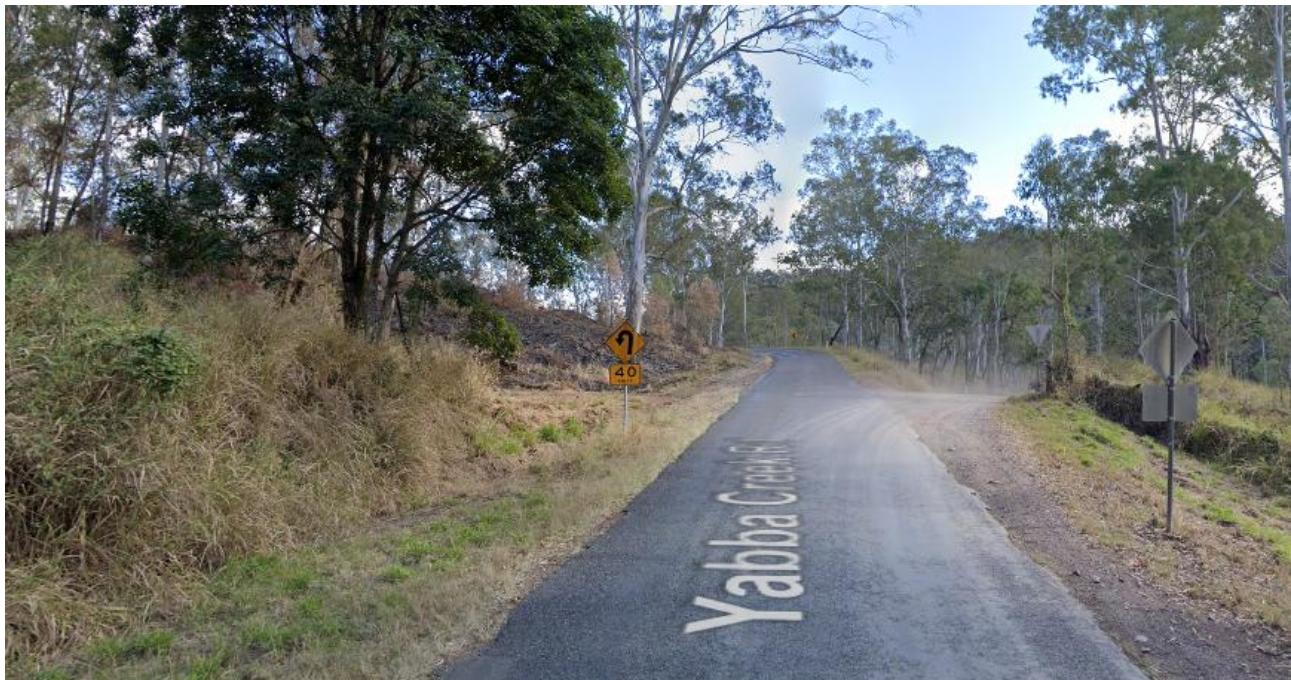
Yabba Creek Road / Bella Creek Road intersection (source: Google Street View)
